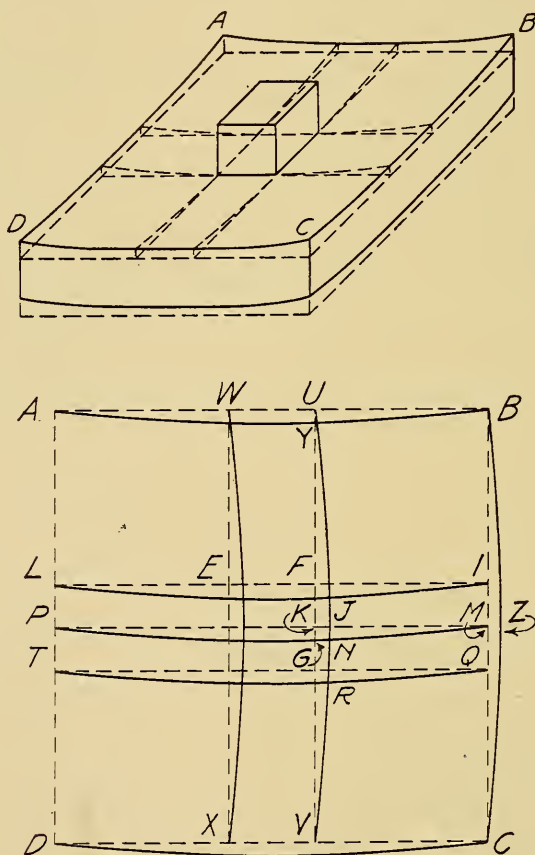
FORM TAKEN BY COLUMN FOOTINGS UNDER LOAD.
